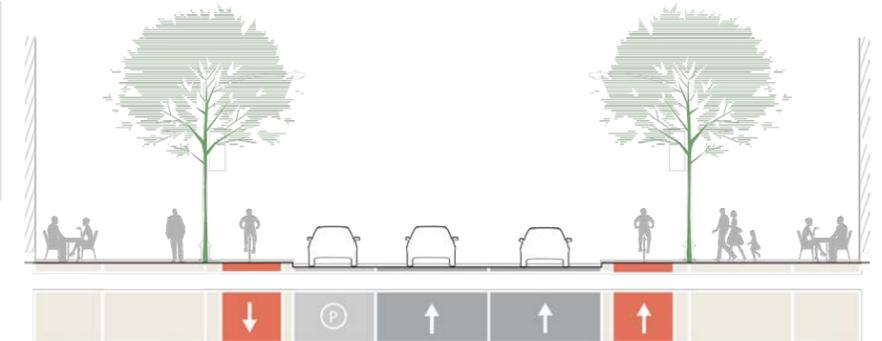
Cross Section Alternative - Bike Lanes, Parking and Loading along full block
